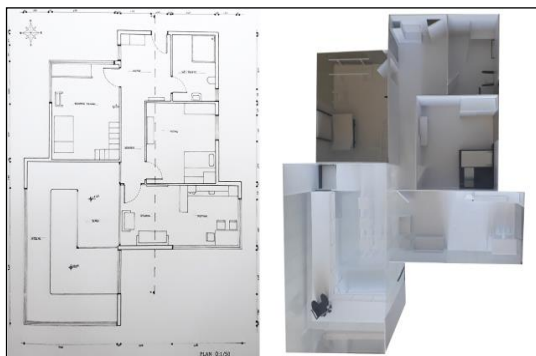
Plan and model top view of the example house of Student Group 32 - Accessibility.
